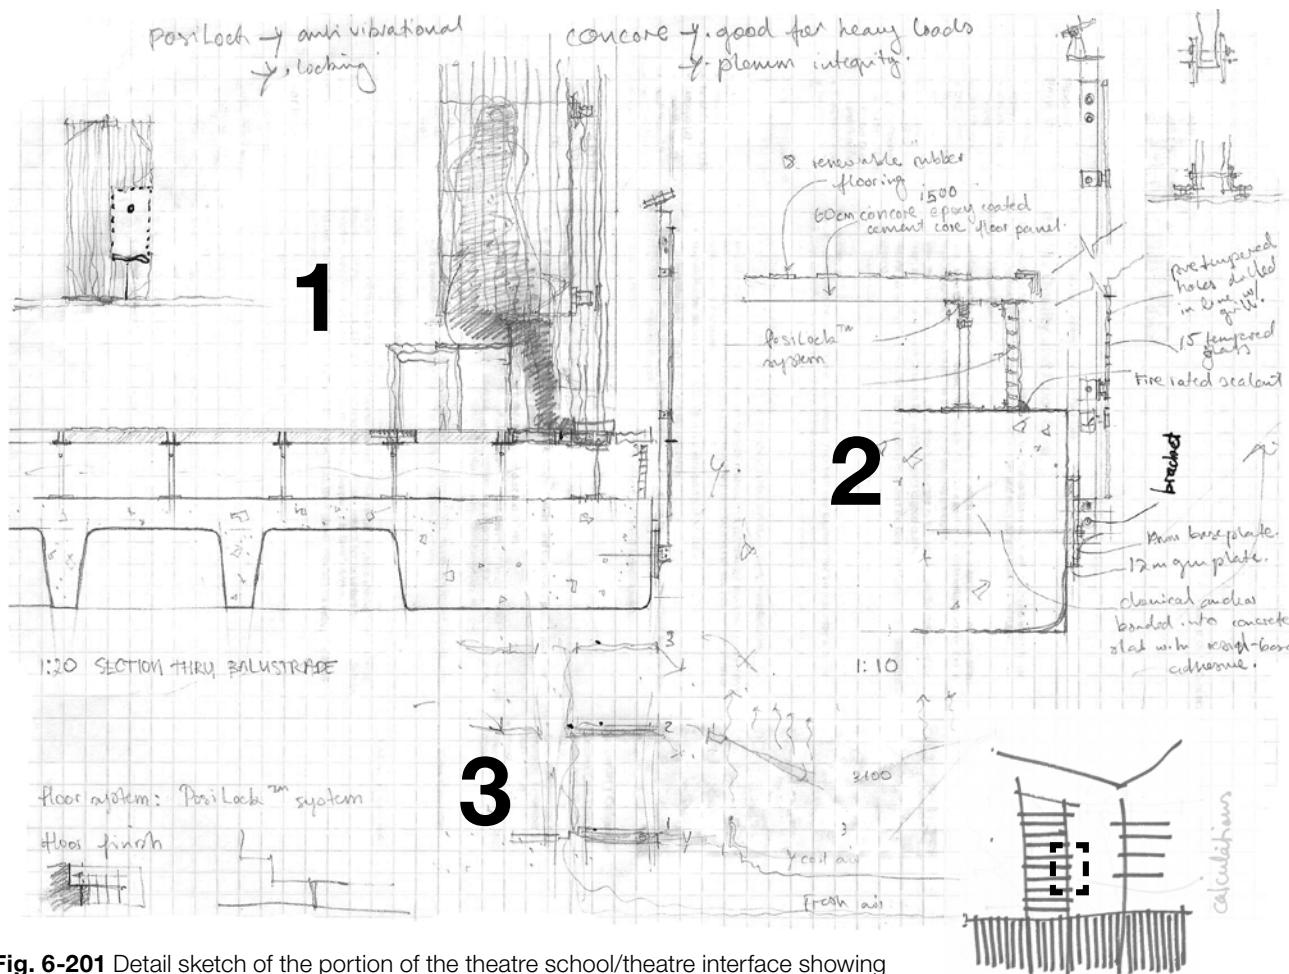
Detail sketch of the portion of the theatre school/theatre interface showing elements of the proposed ventilation strategy: (1) Section through new plenum floor built on existing concrete slab, with adaptable seating and balustrade; (2) Close-up detail section of plenum floor outlet and balustrade; (3) Spatial heating and ventilation concept sketch.
